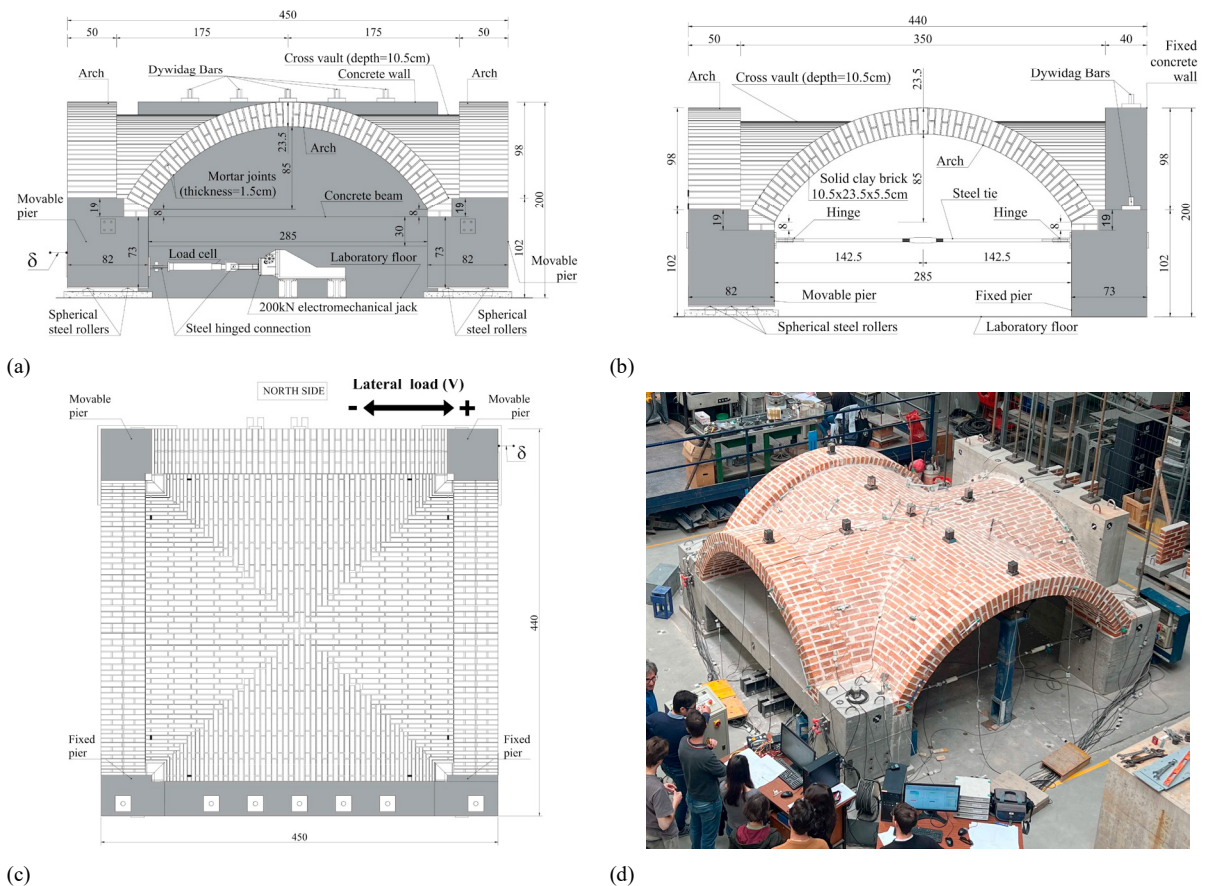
Schematic of the full-scale cross vault and the test rig: (a) north-side; (b) west-side; (c) plan. (d) Actual view. (Dimensions in [cm])
